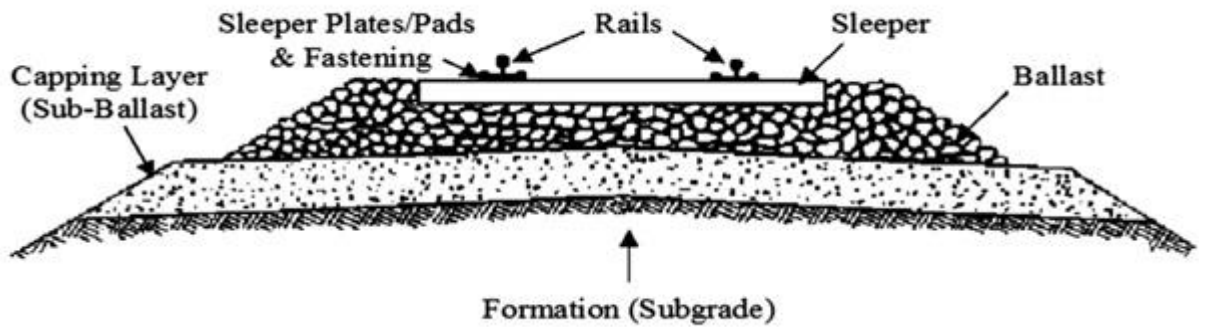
Ballasted Track cross section (Elkhoury 2018)
